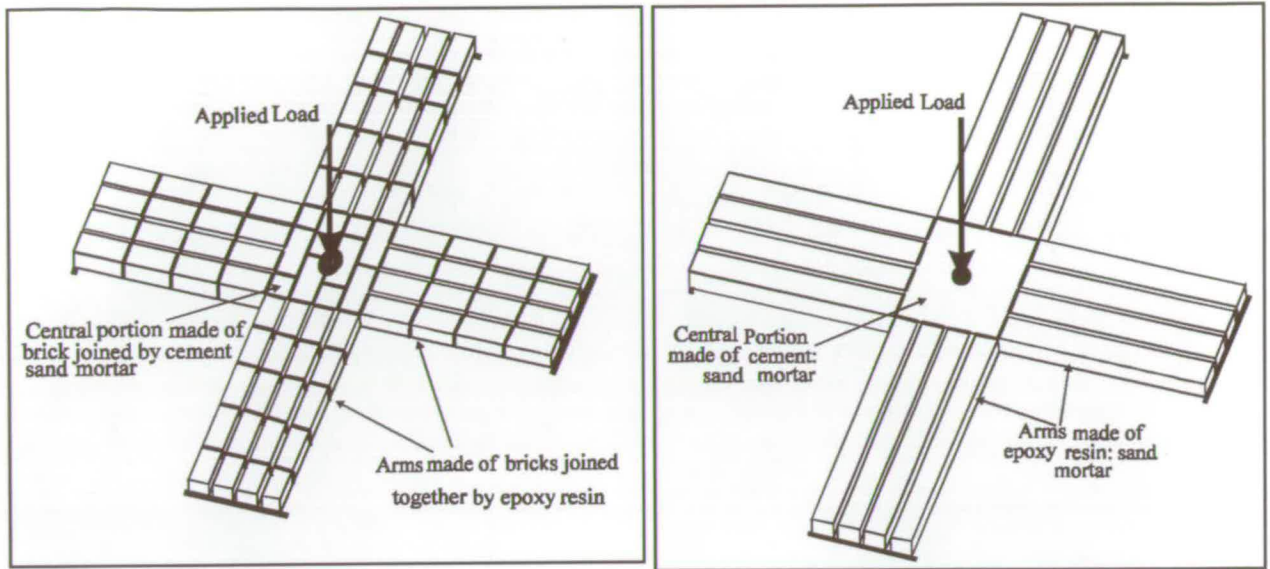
a) Masonry Cross Beams, b) Mortar Cross Beams.
